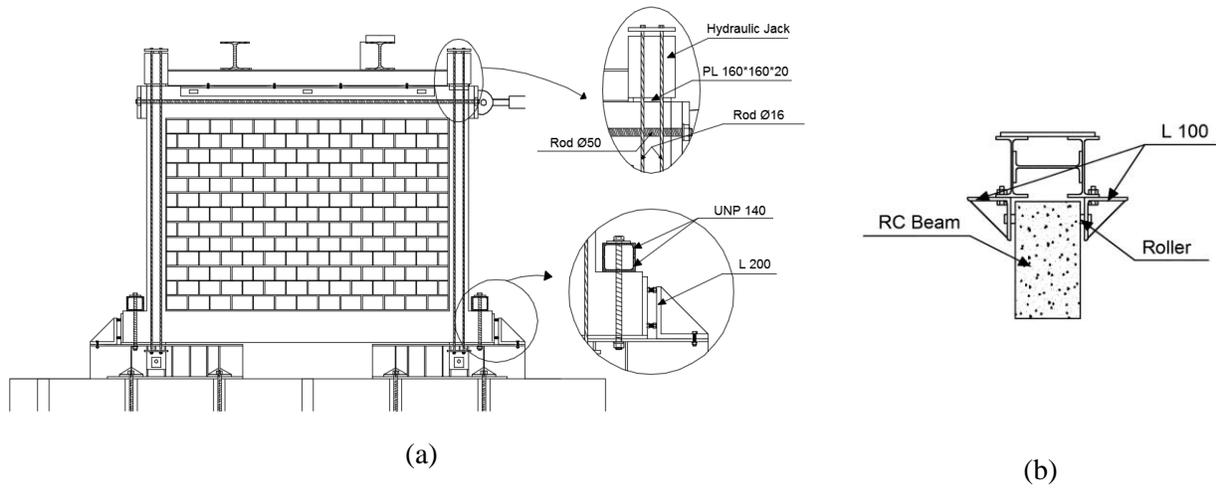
a) Test setup for in-plane cyclic loading b) out-of-plane support of the upper beam in the in-plane testing
